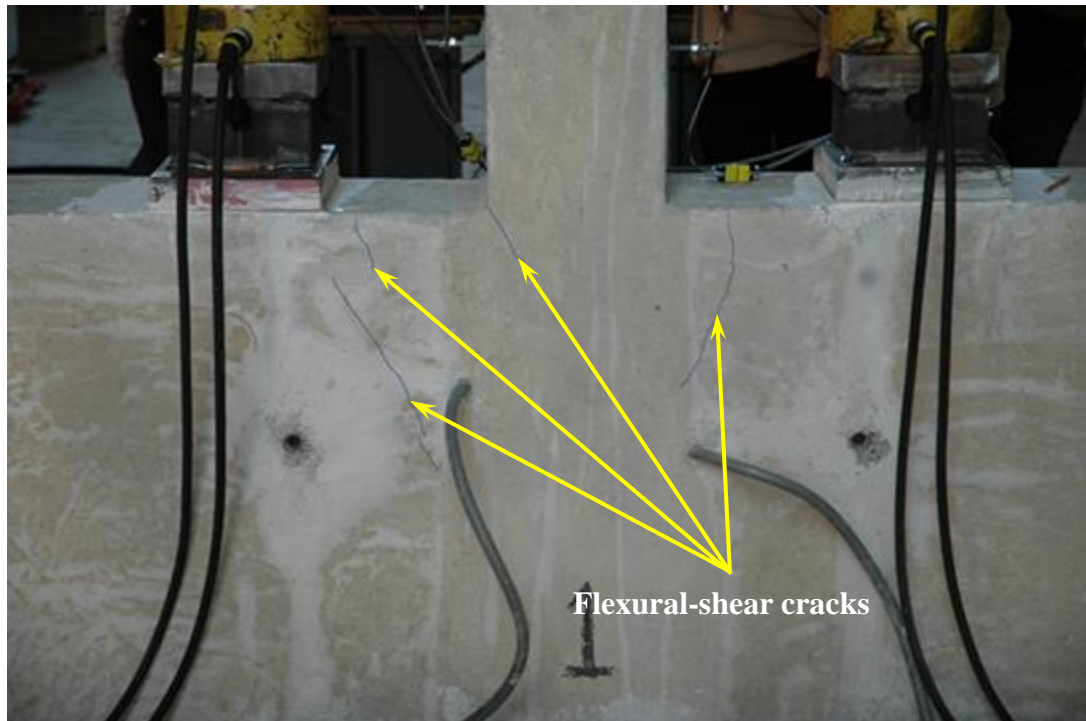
Flexural-shear cracks in bottom beam of TS01
